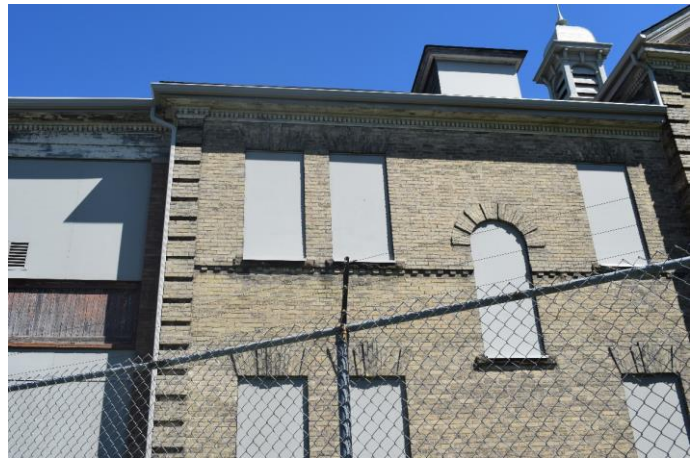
Infirmary brick quoins and brick window arches on south elevation of west wing looking north
